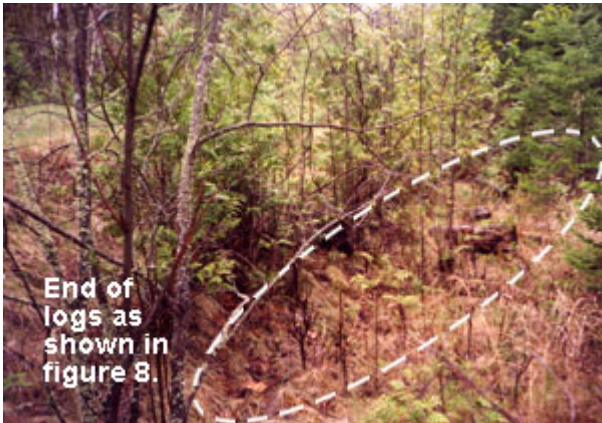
Log corduroy (selected area) was used for cross drainage on this road.
